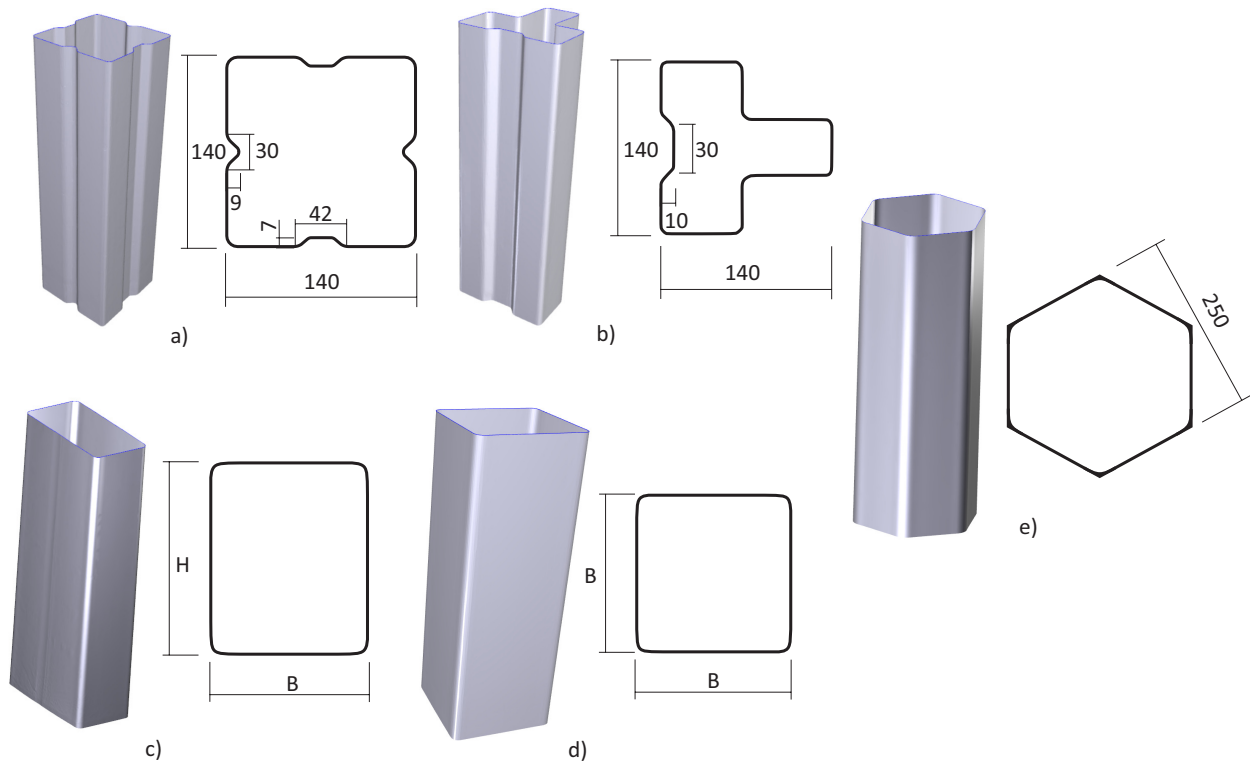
Tested sections: a) square hollow section with stiffeners (SHS-S); b) square hollow section with stiffeners and T-shape (SHS-T); c) rectangular hollow section (RHS); d) square hollow section (SHS); e) hexagonal hollow section (HEX).
